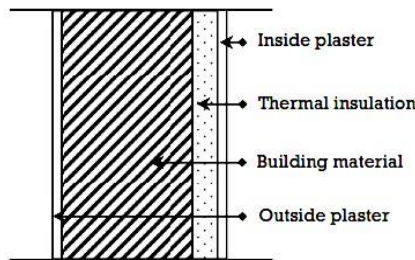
Wall section for the most commonly used external wall structure in Egypt
